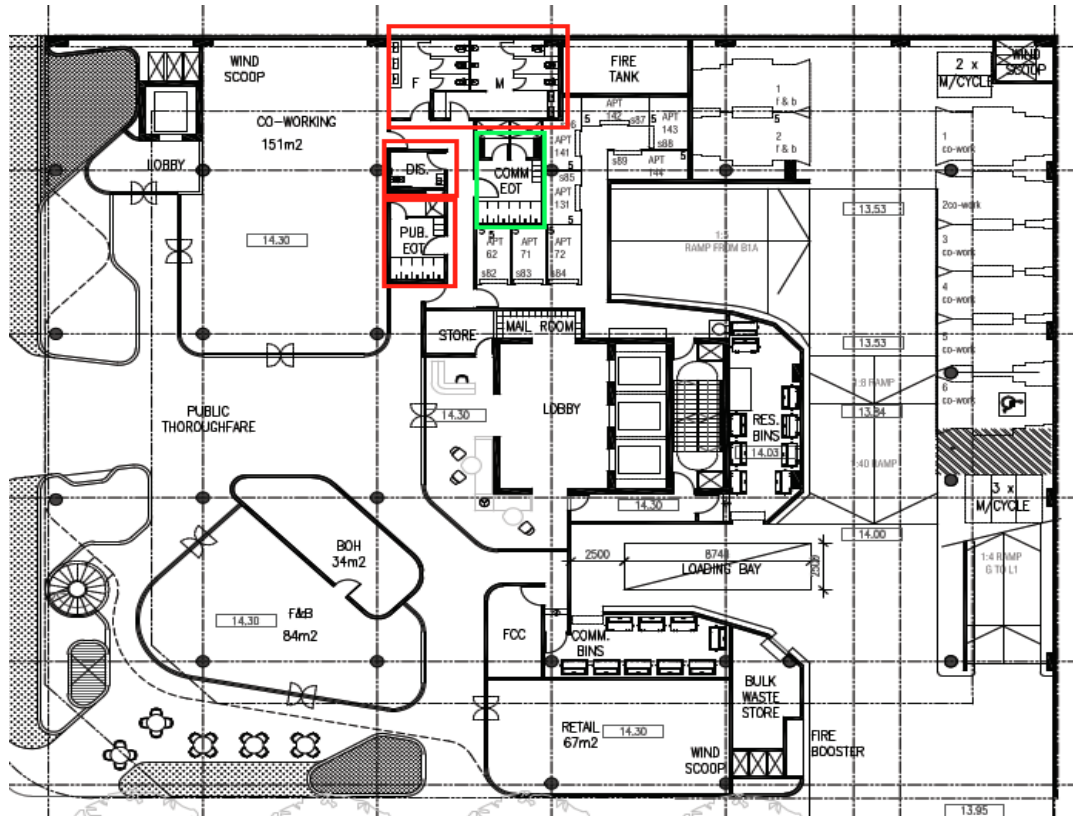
Ground floor plan presented at December Canning Bridge Design Review Panel Meeting with the public end of trip facilities marked in red, with the commercial end of trip facilities marked in green
